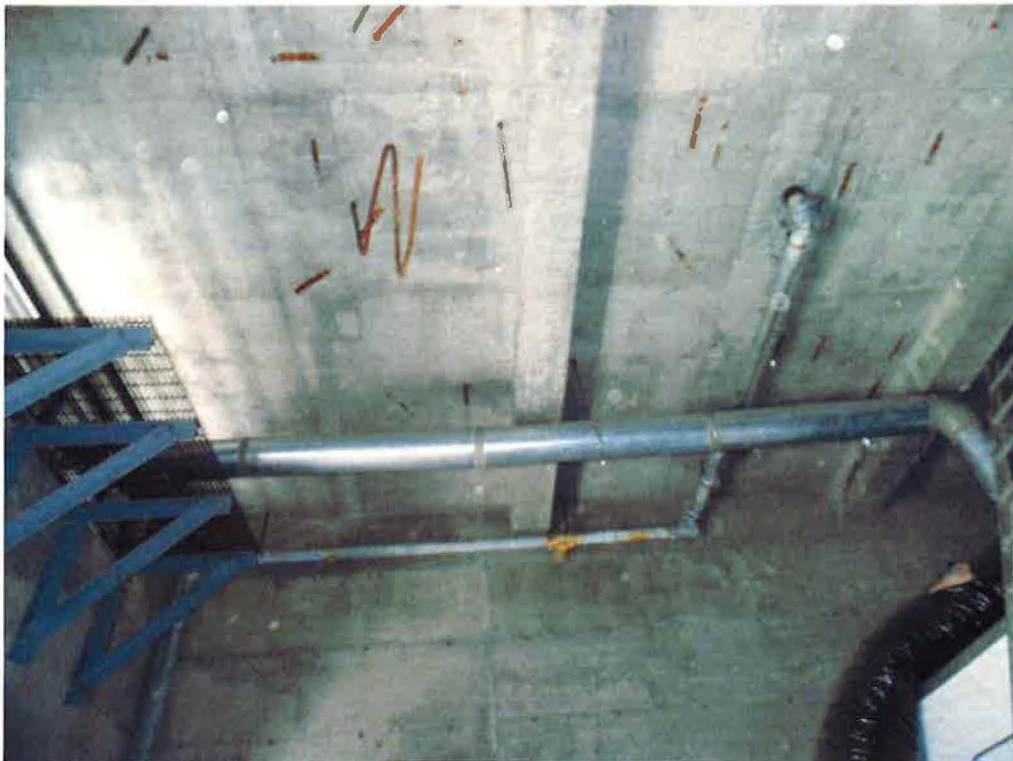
Sample photo illustrating the existing beta sector ballast frame.
